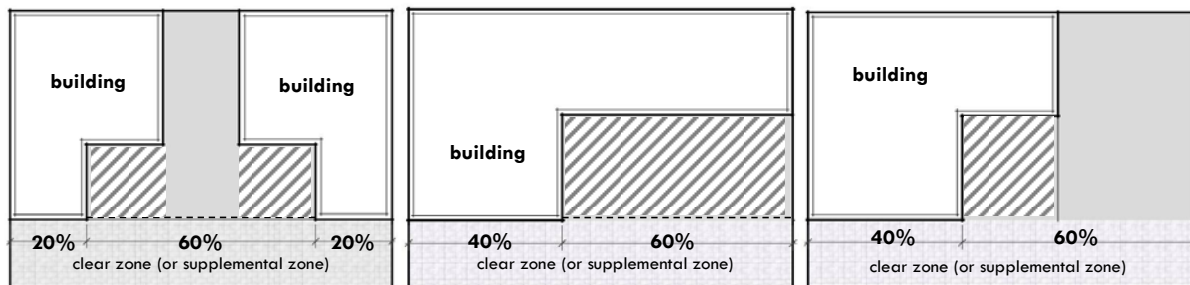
Examples of permitted building placement on urban roadways. Parking is generally not permitted in the hatched area between the street-facing building facade and the sidewalk.
